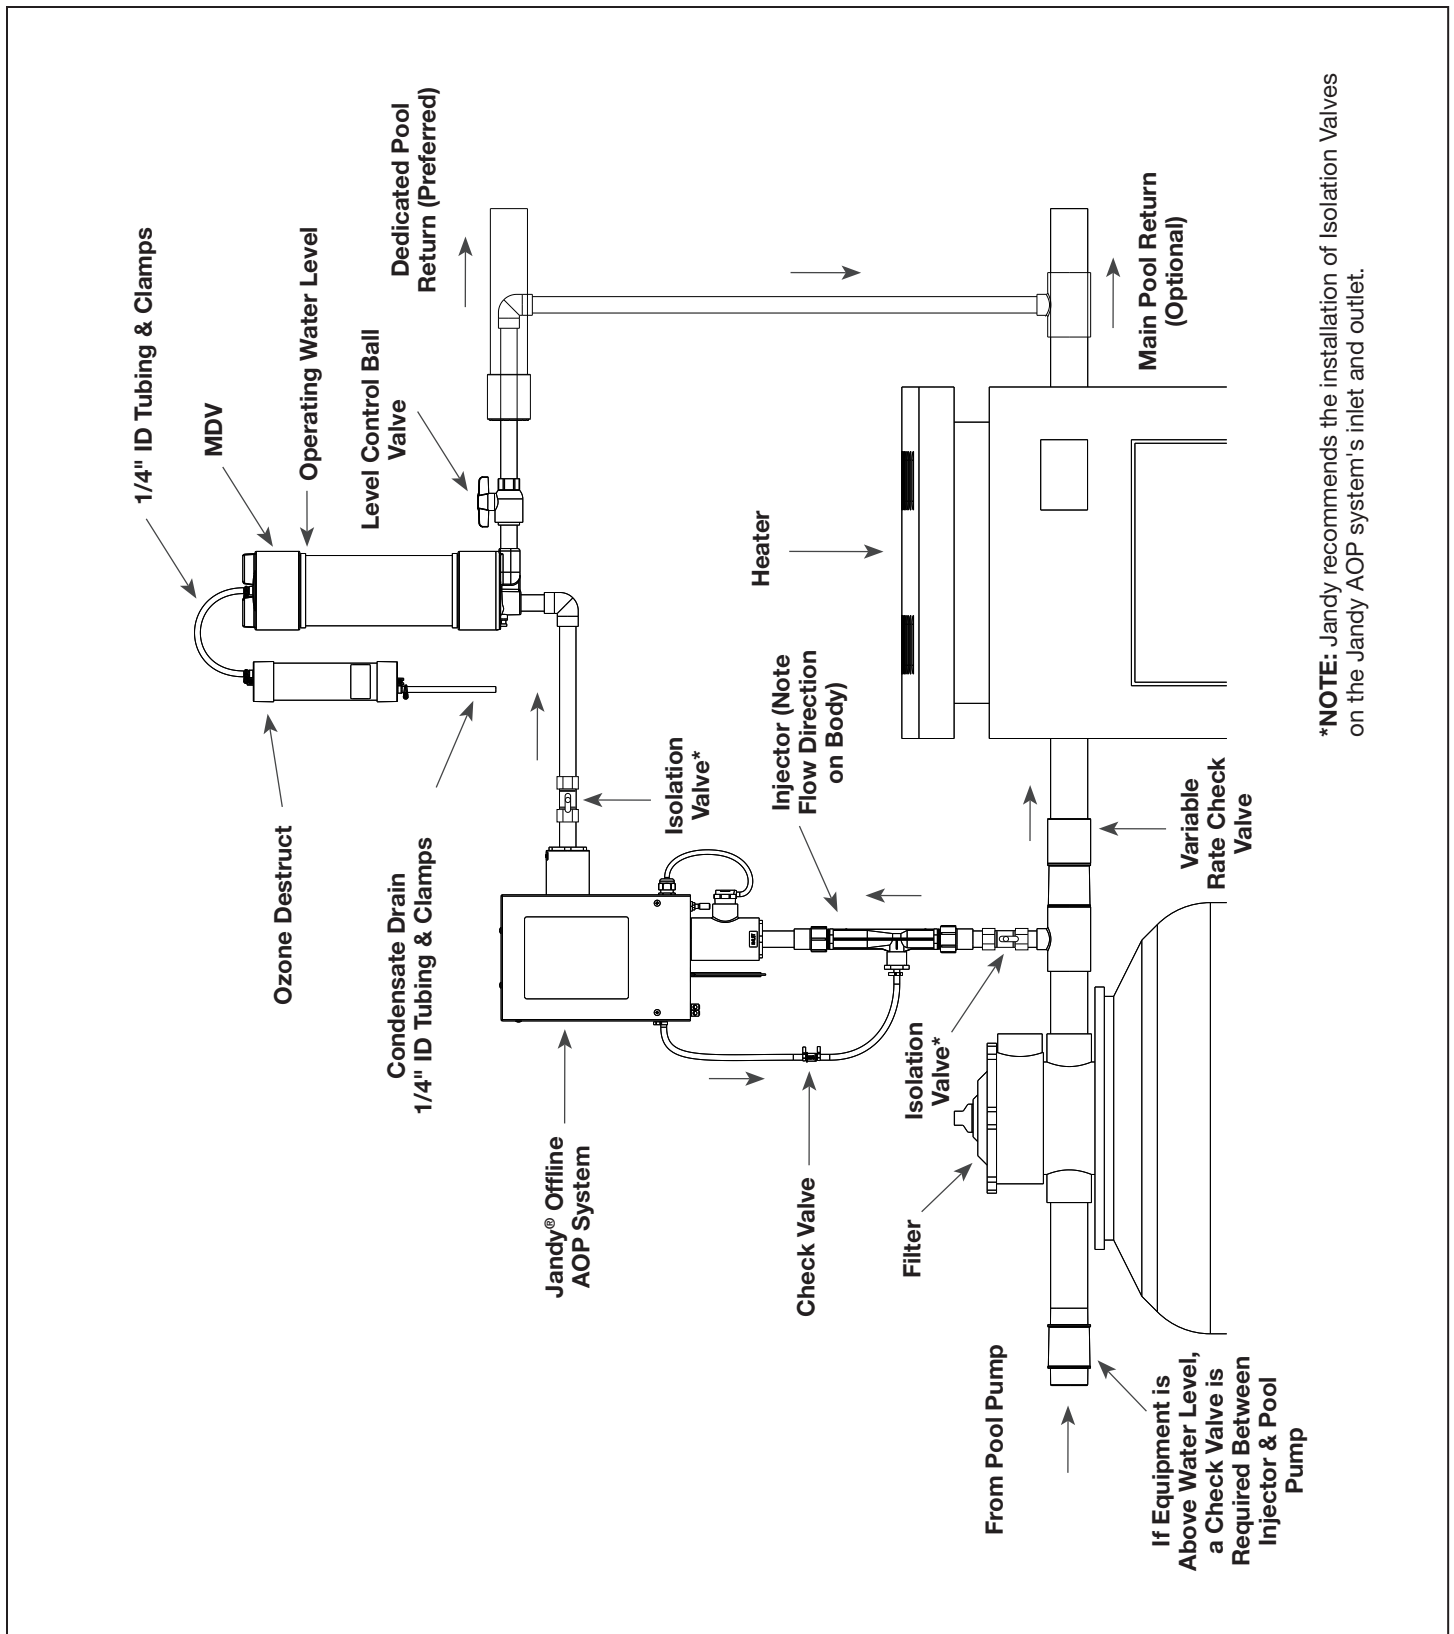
Typical Plumbing Arrangement with MDV (Pool with Heater)
